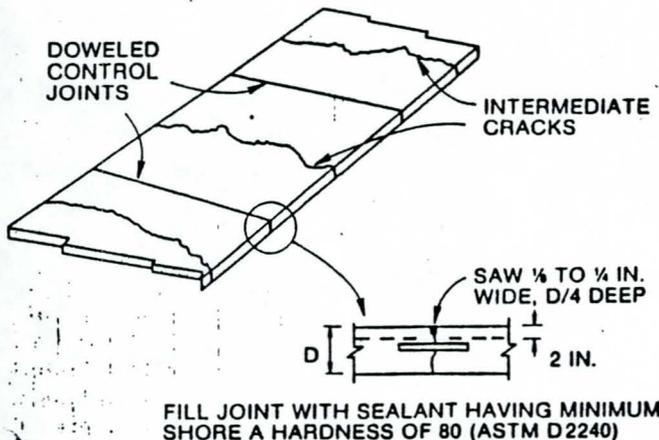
Reinforced (mesh-dowel design) floor slab.
